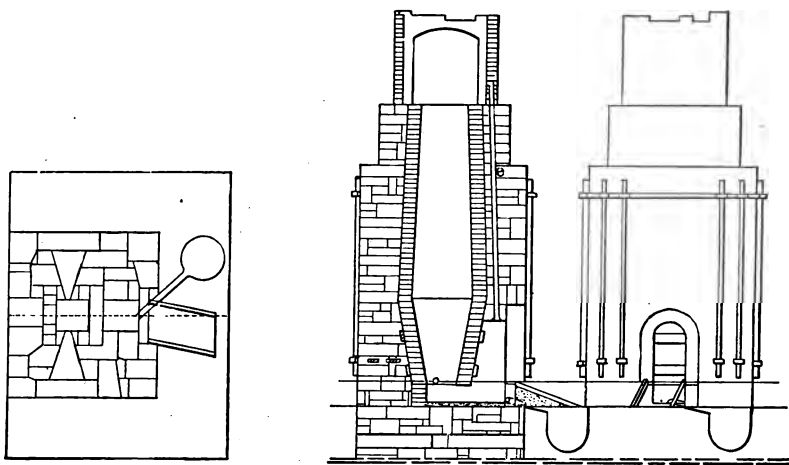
Cornish tin castle; plan, vertical section and front elevation
